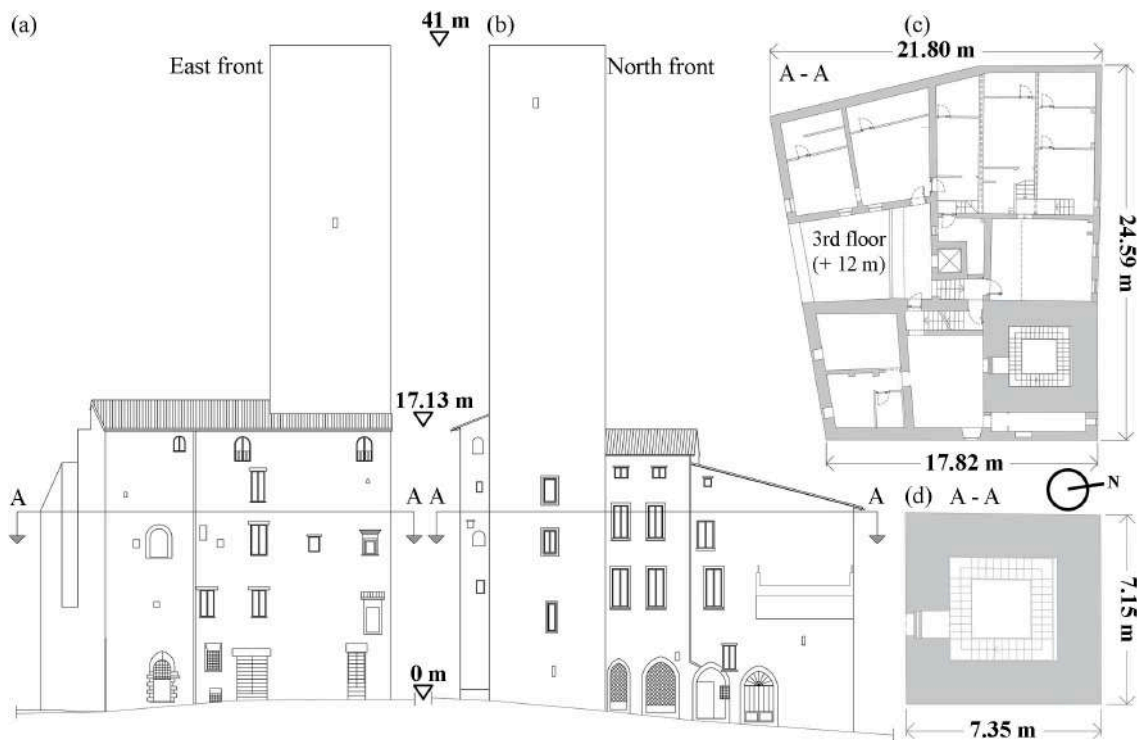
The Sciri Tower: East front (a), North front (b), plan view at 12 m height (c) and cross section of the tower (d).
